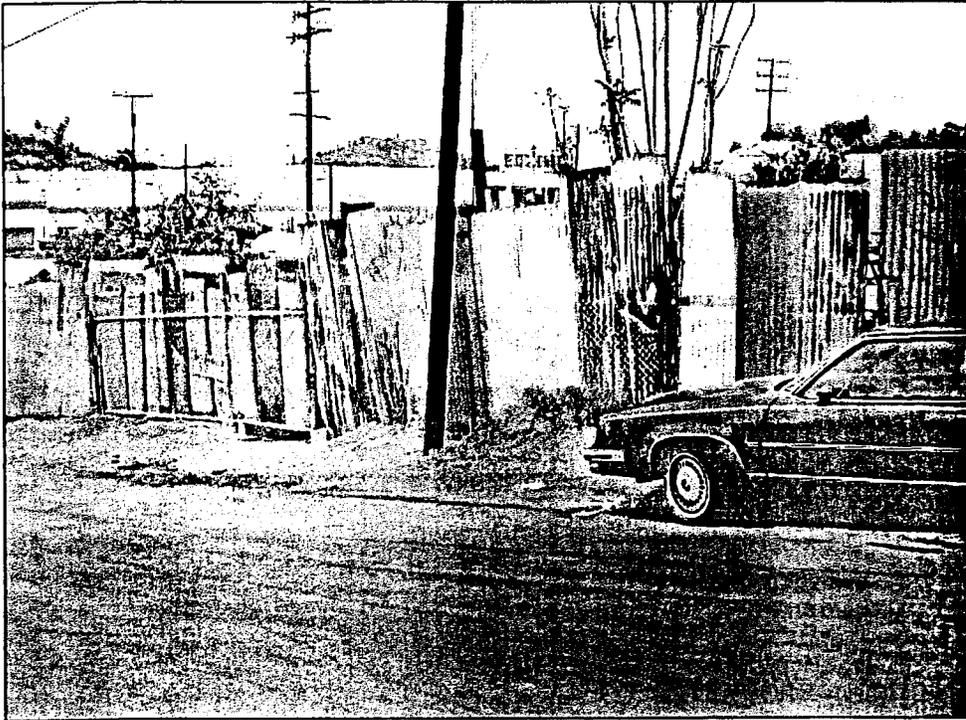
No sidewalks, curbs or gutters on southeast corner of Bonnie Beach & Medford St.
